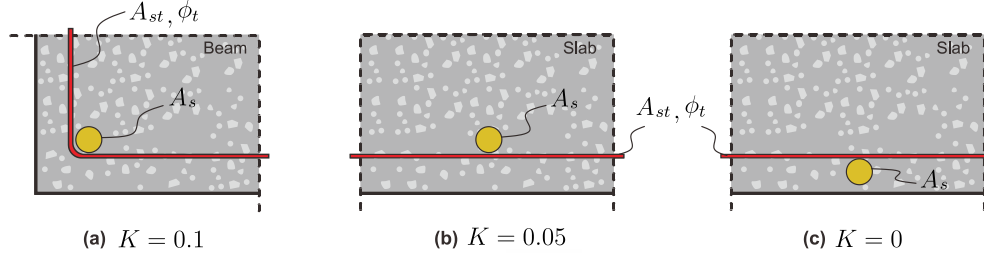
Values for K for beams and slabs with transverse reinforcement.
